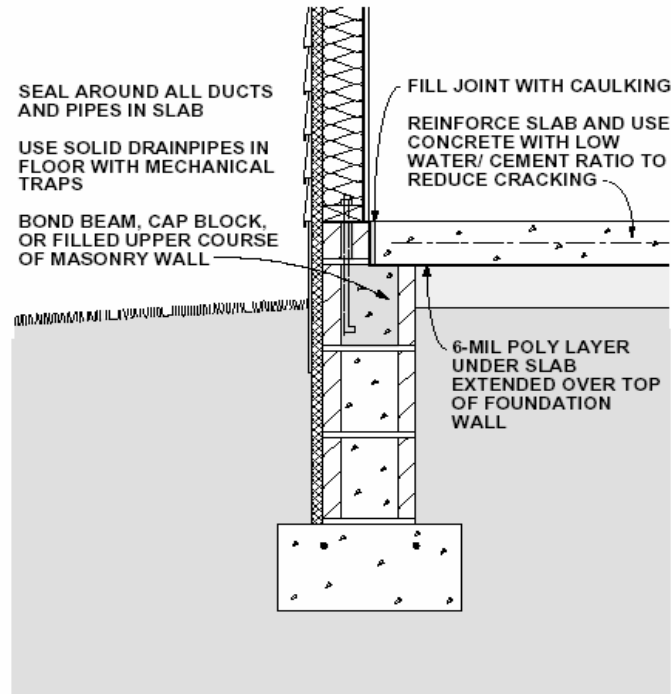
Radon Control Techniques for Slab-on-Grade Foundations
